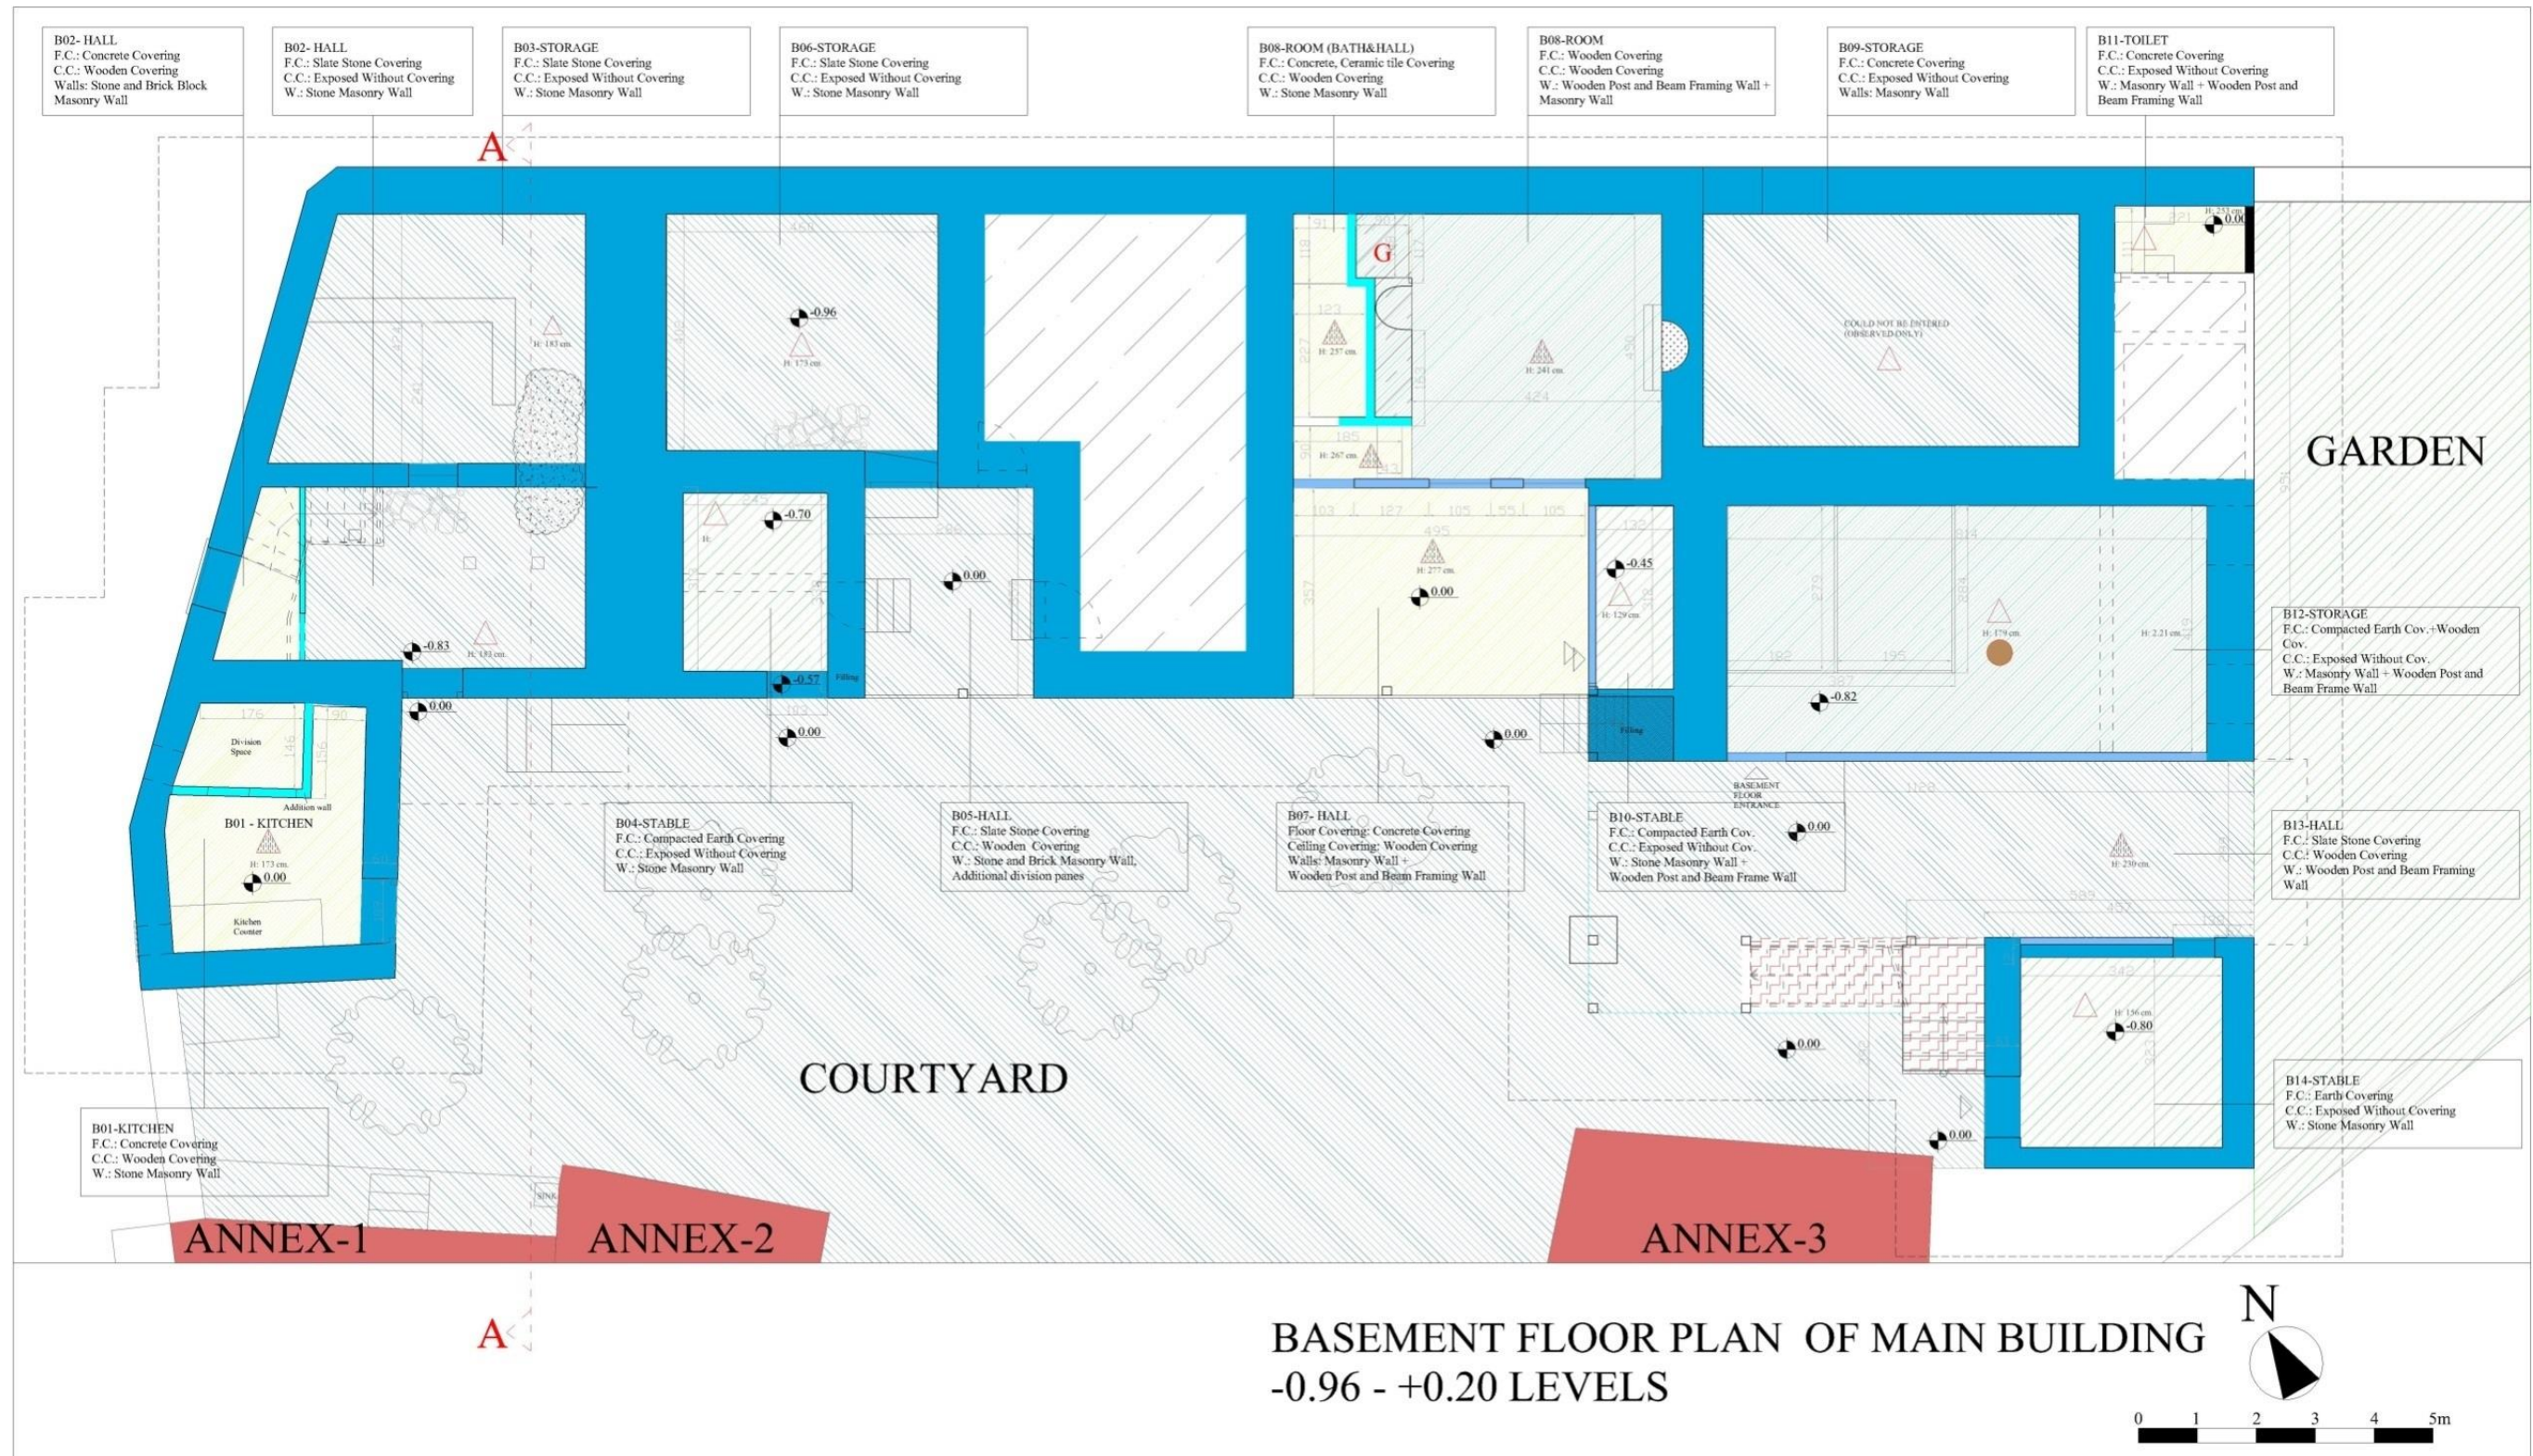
Structural Characteristics: Basement Floor Plan (-0.96 and +0.20 Level)
